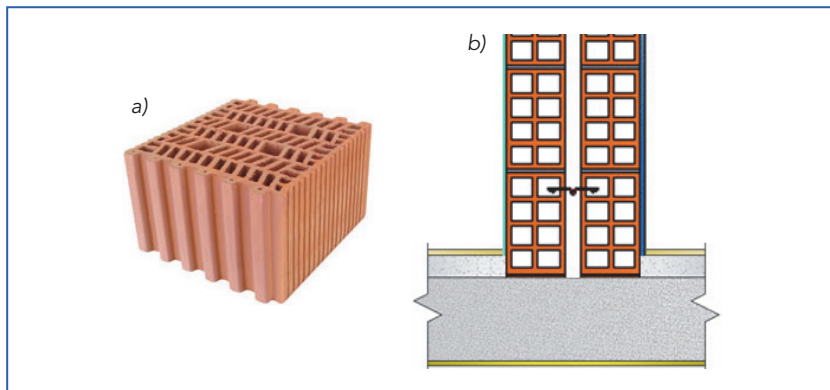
Building with continuous floor slabs and a masonry cavity separating wall. [[2] - (Italy)].
